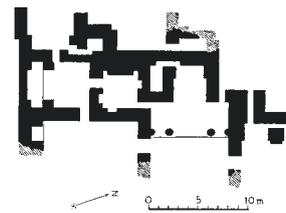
Ctesiphon, house Ma'āriḍ IV, detail of ground plan. – (After Reuther, Architecture fig. 156 b. Detail, new scale).
